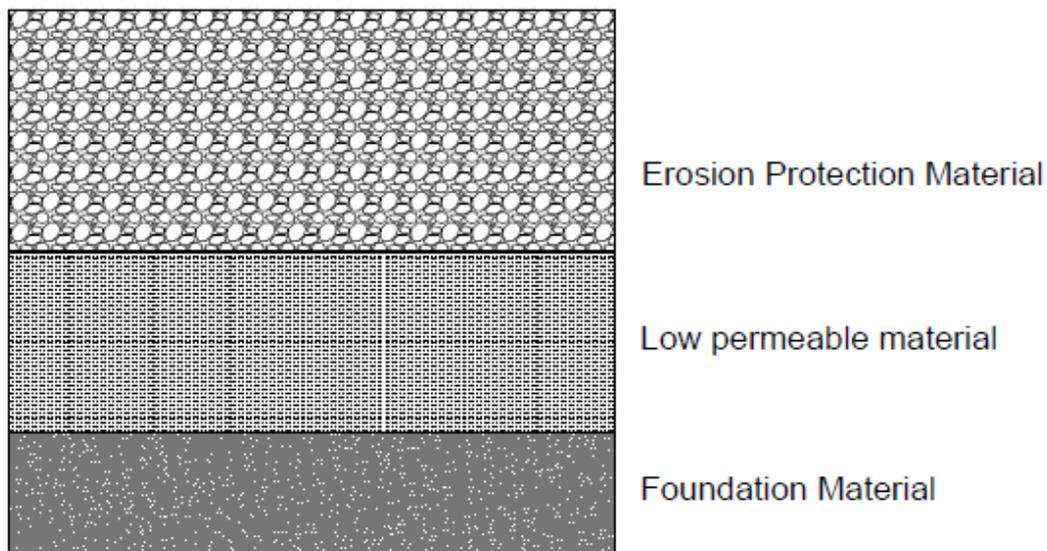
Natural foundation reinforced with a low permeability clay liner and erosion protection material.
